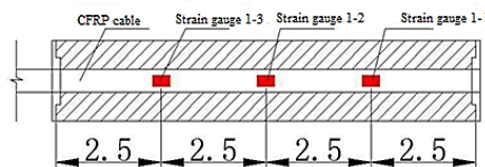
The radial cable anchor with strain gauge (dimensions: mm)
